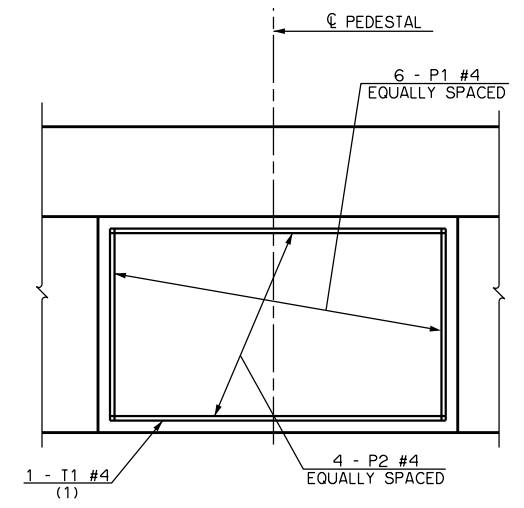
DETAILS OF ABUTMENT NO. 2 (SHEET NO. 1 OF 2)
